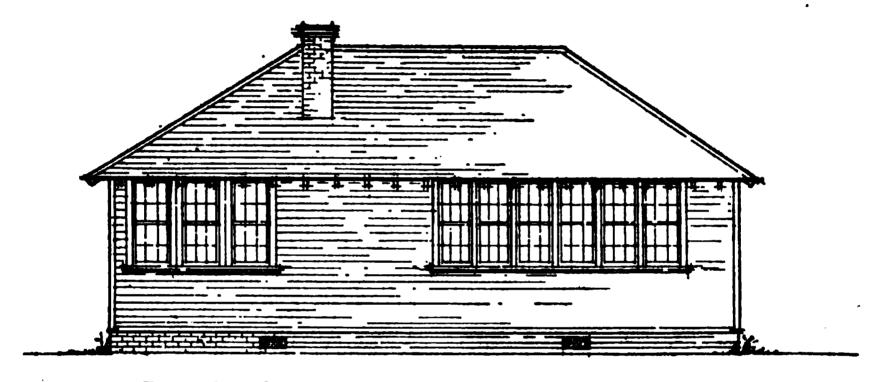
Rear elevation, rural school designed by J. L. Sibley (see p. 107).
